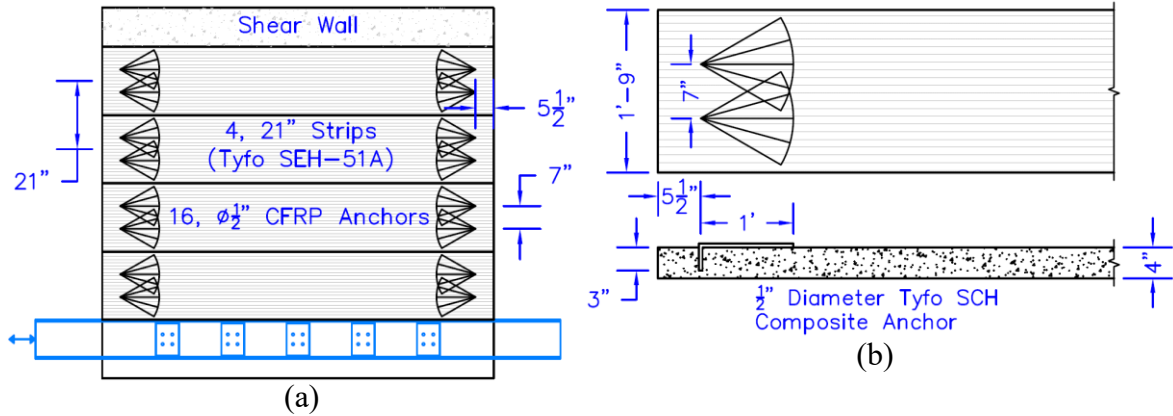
Retrofit of Specimen CD4: (a) Plan View of Retrofit; (b) Anchor Details.
